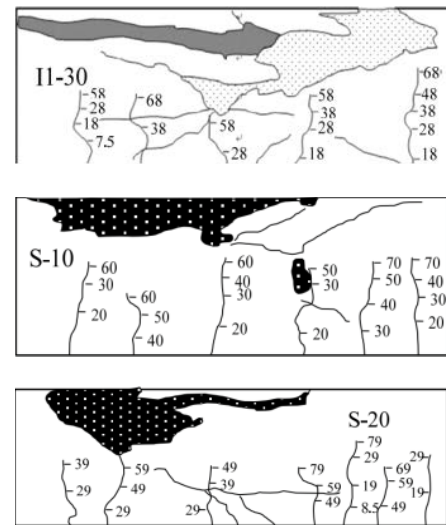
Description of corrosion crack expansion diagram of steel structure in seaside construction.
